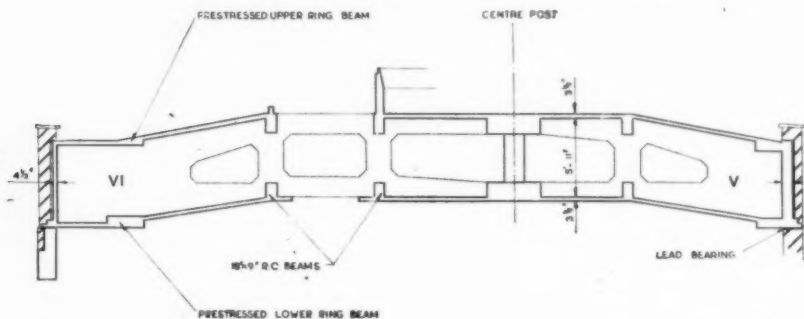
Main Vierendeel Girder V/V.1 in Elevation (Section AA on Fig. 2).
